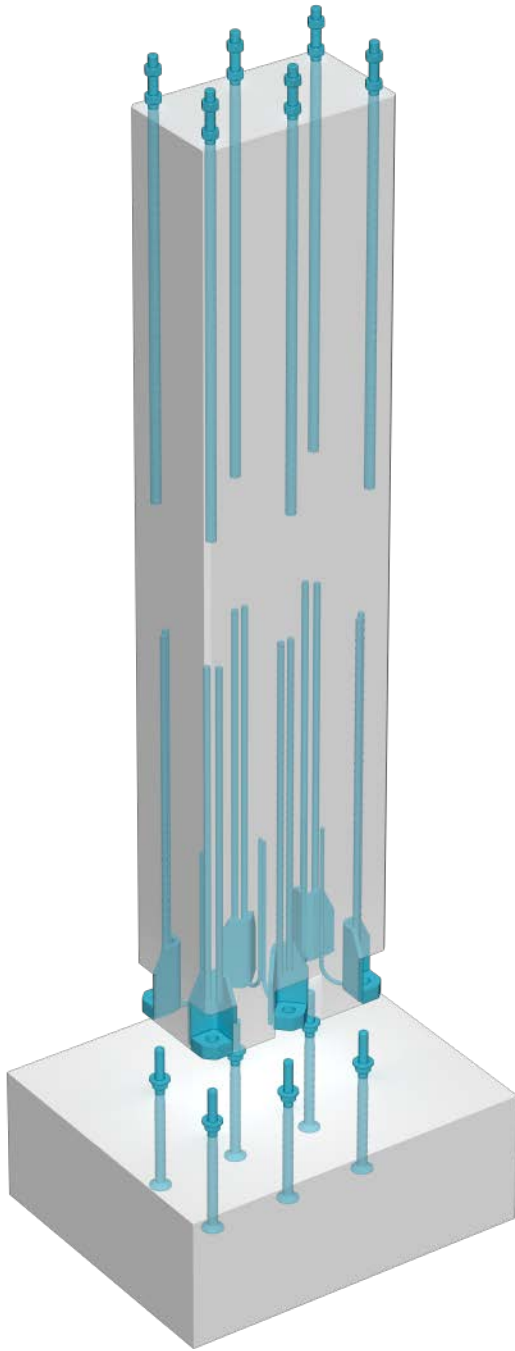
HPM® L Rebar Anchor Bolts in a concrete column to footing connection.
